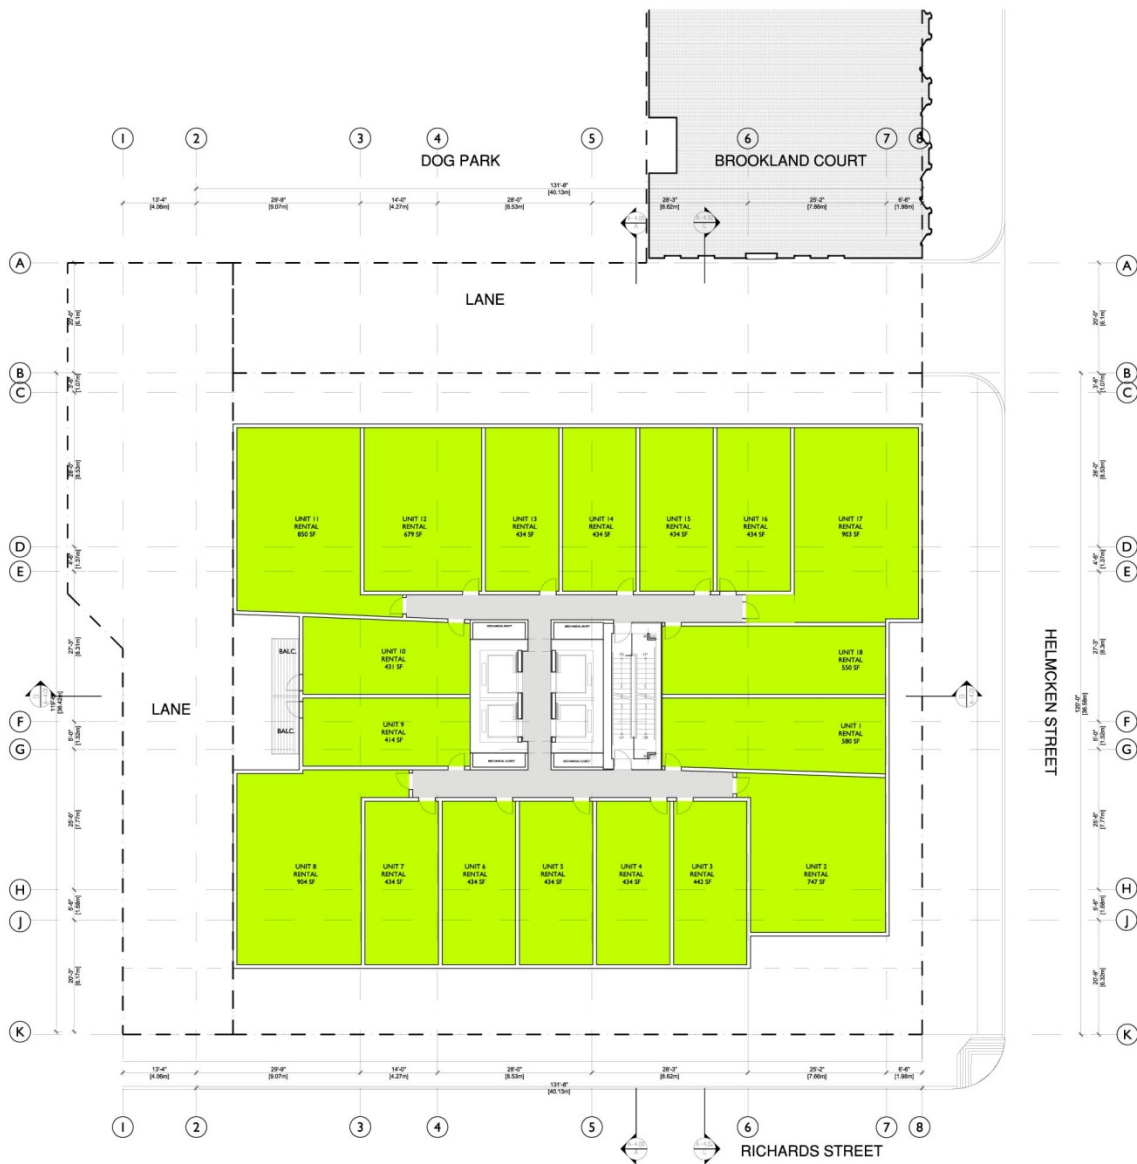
Typical Rental Floor Plan - Lower Levels 4-6
